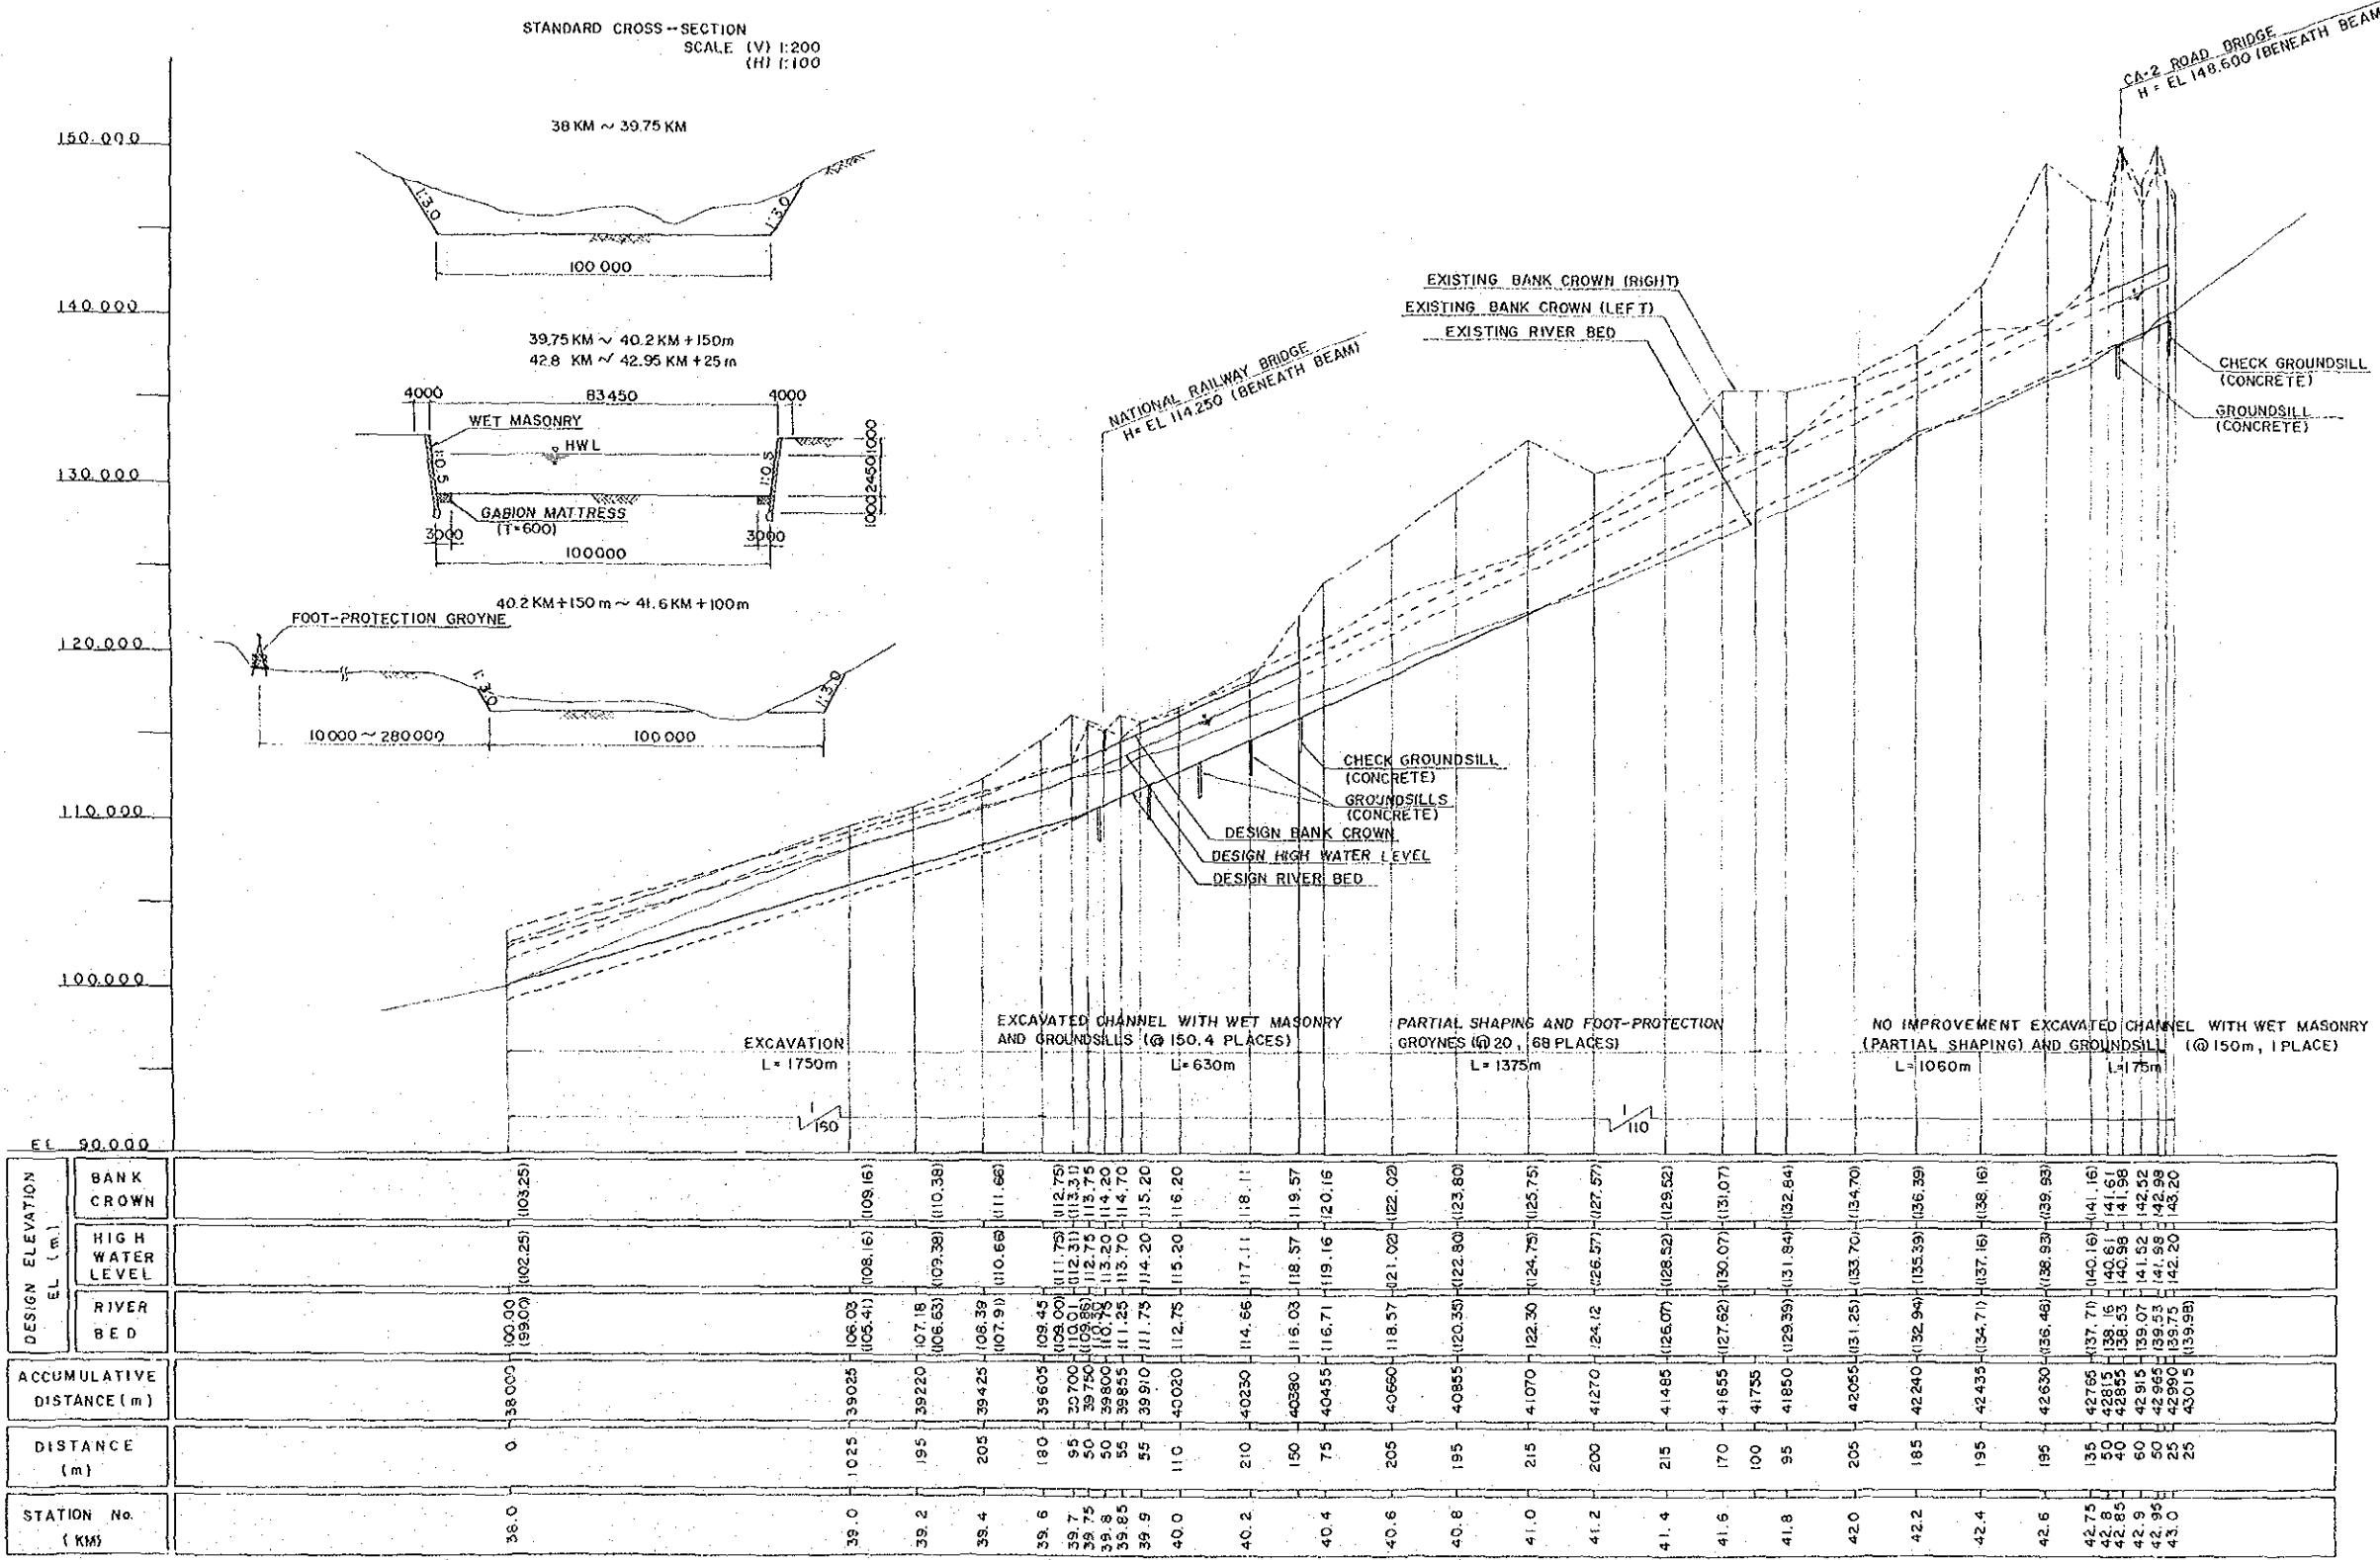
(6/6) PLAN OF RIVER IMPROVEMENT IN THE PROPOSED URGENT PLAN (PANTALEON RIVER)
